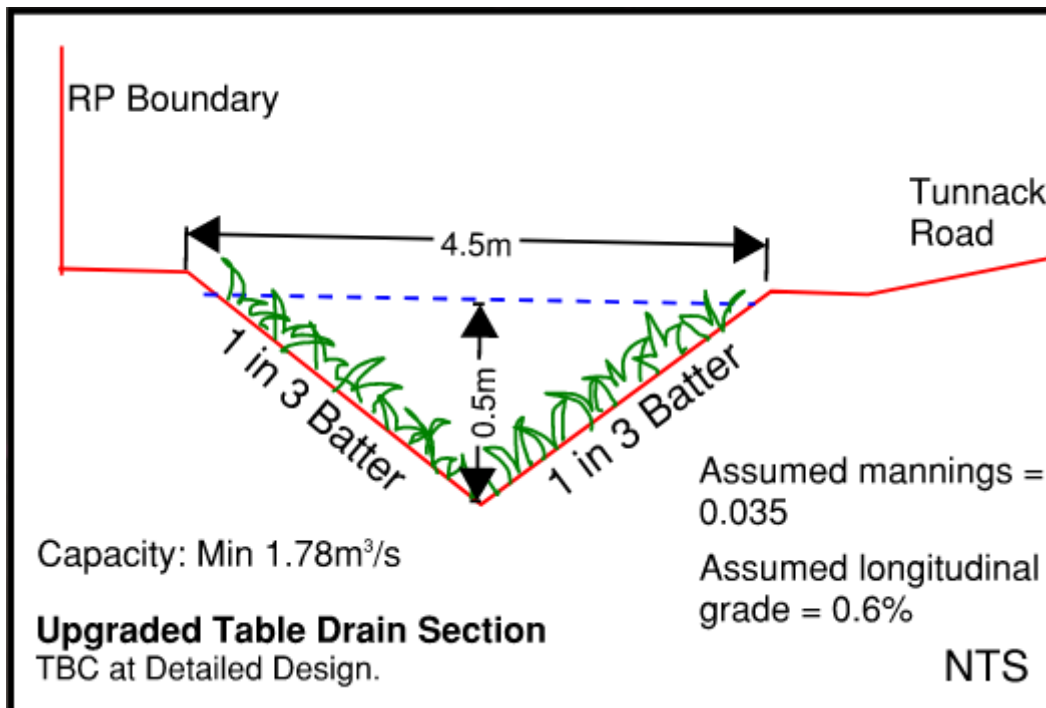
Min Requirements – Table Drain at Tunnack Road
